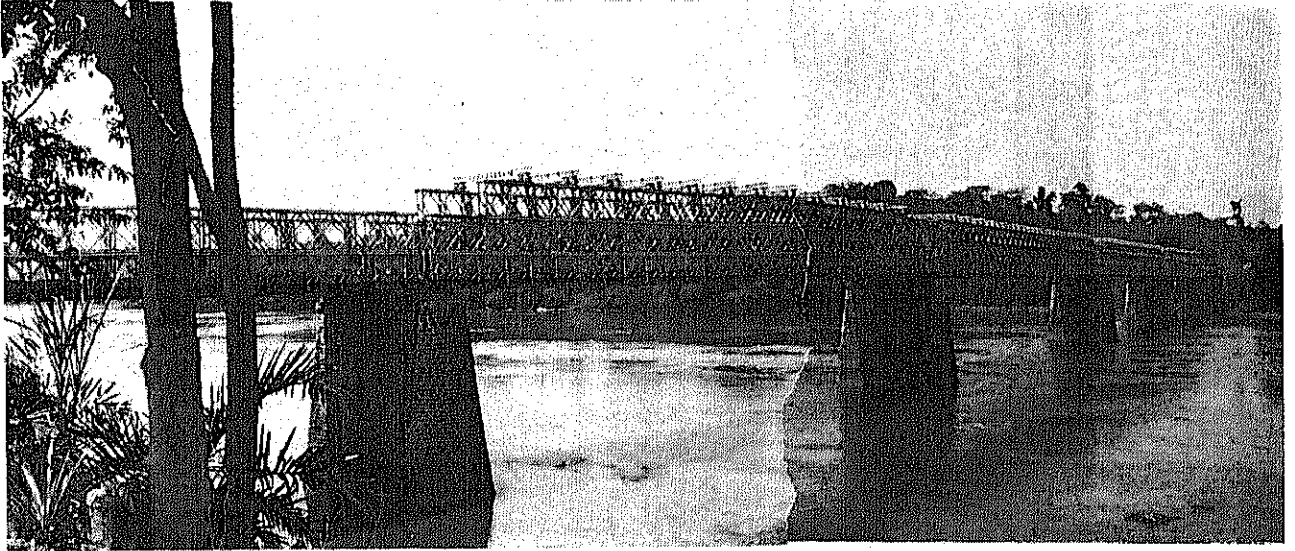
Lindi River Bridge at PK 37 (single lane bally trussed type)
